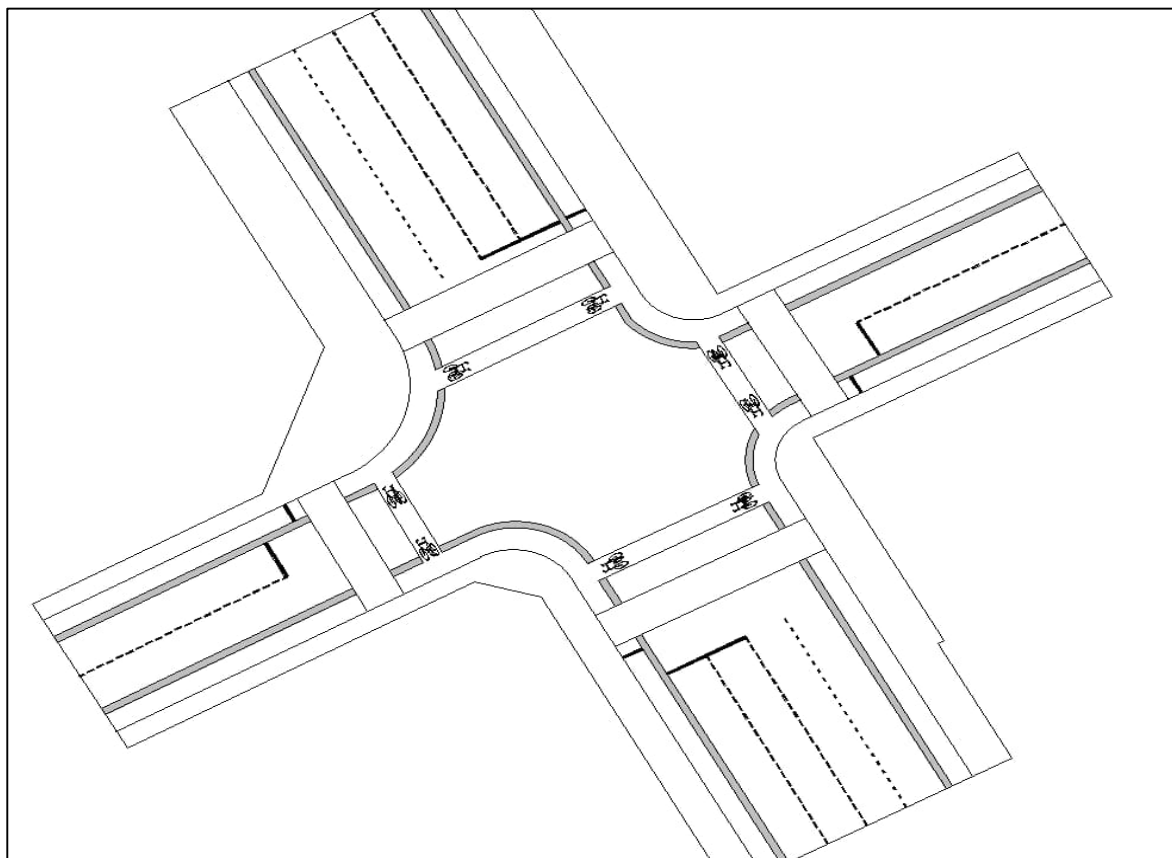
Great Western Road/Anderson Drive Junction - Fully Protected Junction Layout
